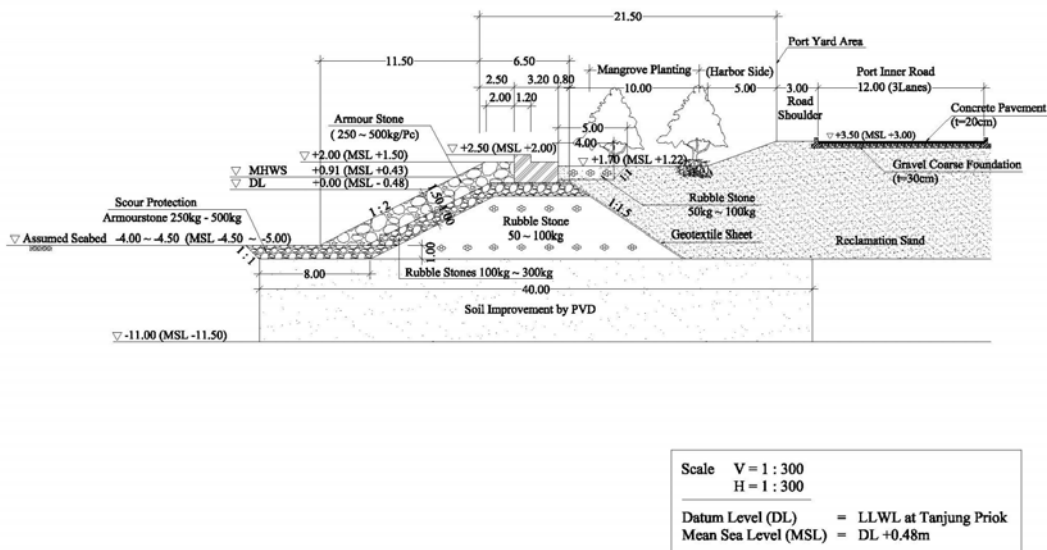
Typical Cross Section of Revetment of East side at North Kalibaru
